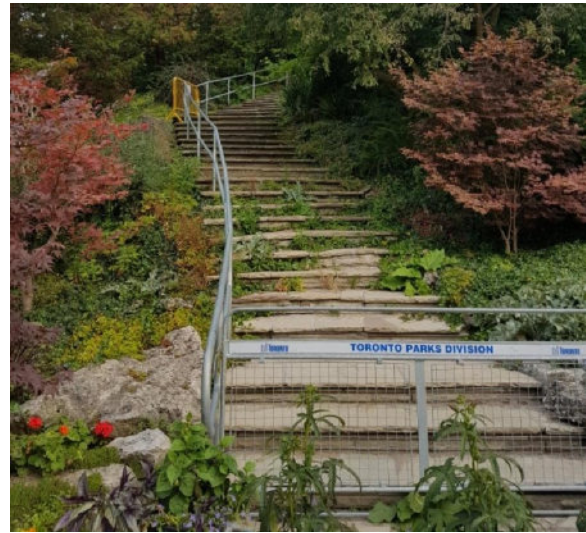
Flagstone steps with steel railing ascending the ravine slope. Adjacent to Bridge 2, looking north.
